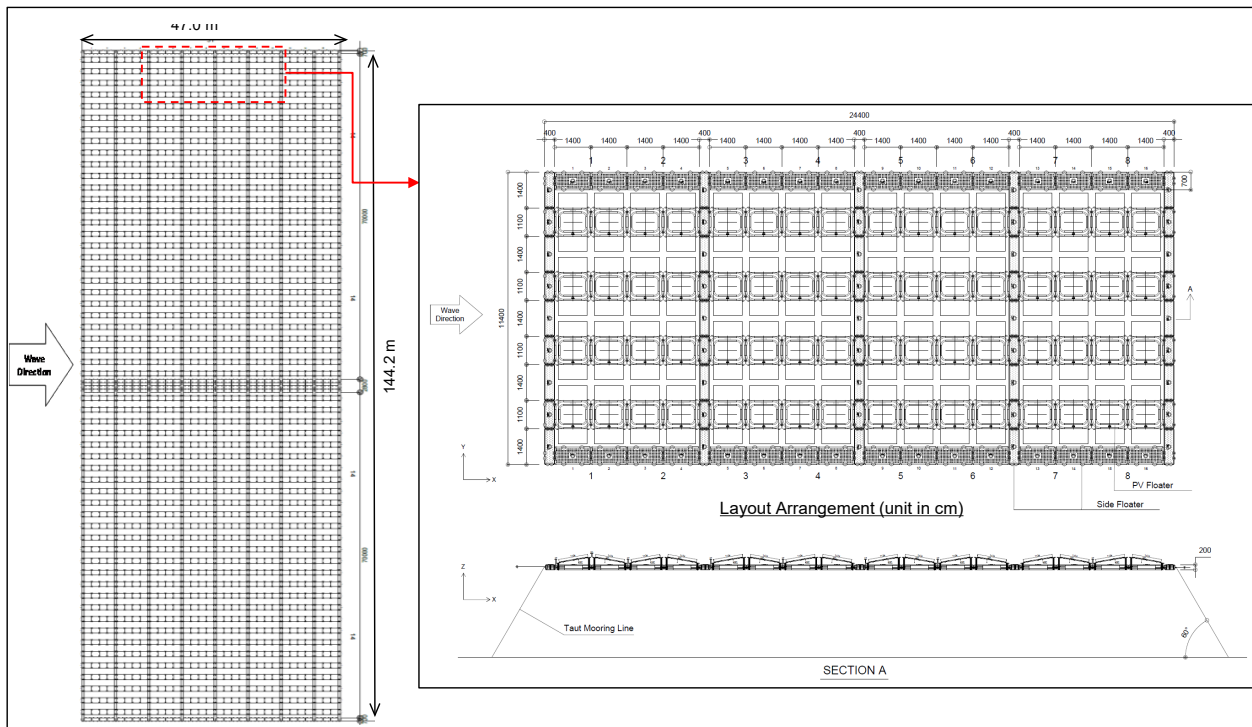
Layout and section arrangement for the prototype of a modular FPV structure.
